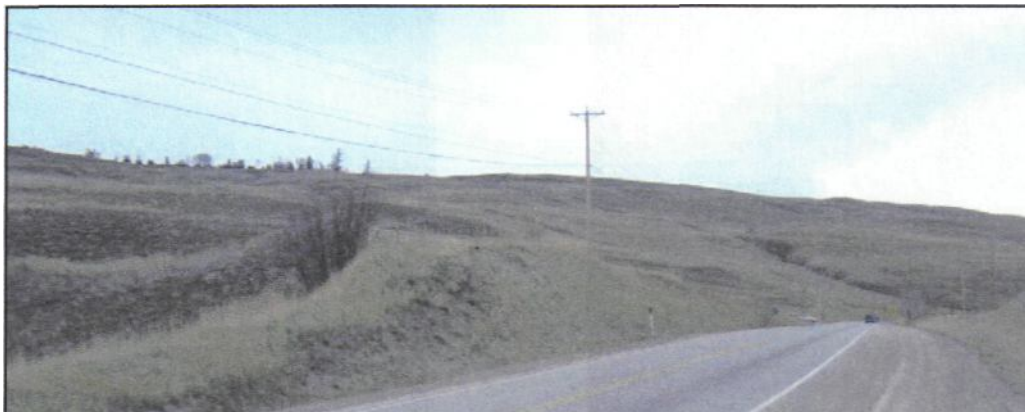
Highway 33 Looking West Towards Pyman Road
